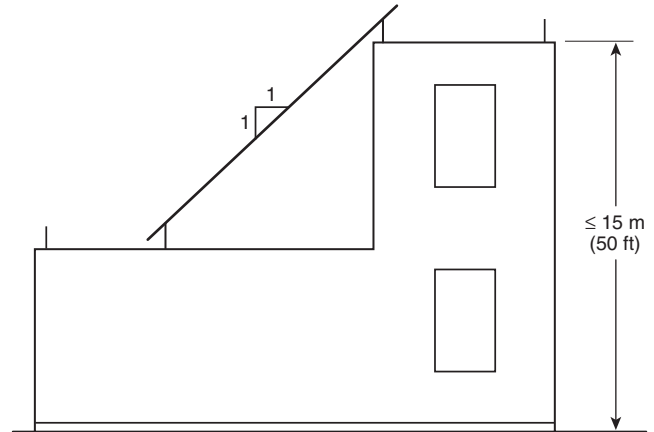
(a) Lower Roof Protection for Buildings 15 m (50 ft) or Less in Height.
